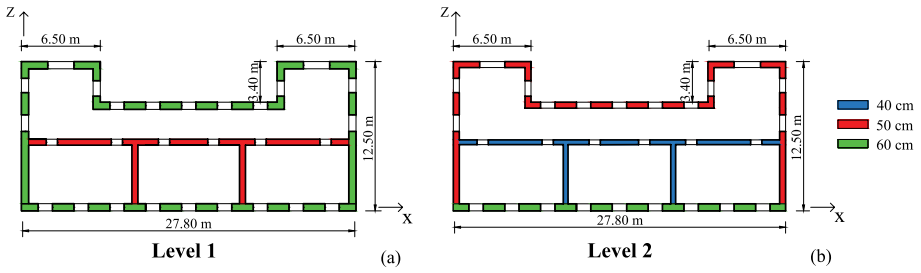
Geometrical dimensions of the case study structure: a Ground floor; b First floor
